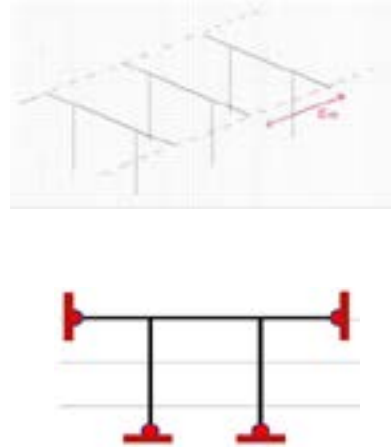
Design Short 4 – multi bay frame spacing and supports
